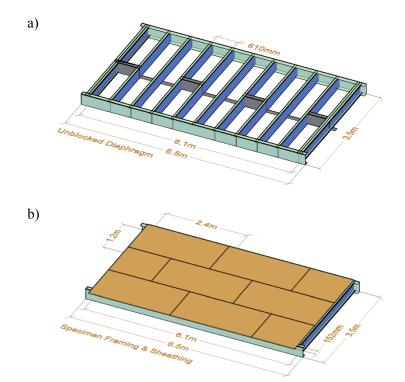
Illustration of a) CFS framing, and b) wood panel sheathing
